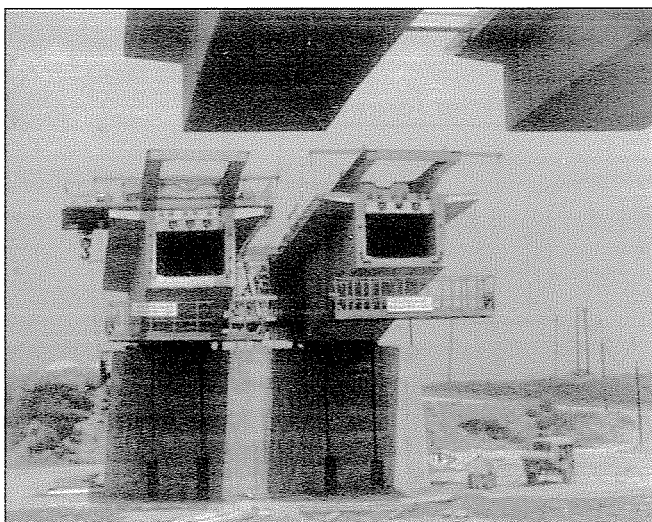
Bridge superstructure using prefabricated girders with curved ground plan
